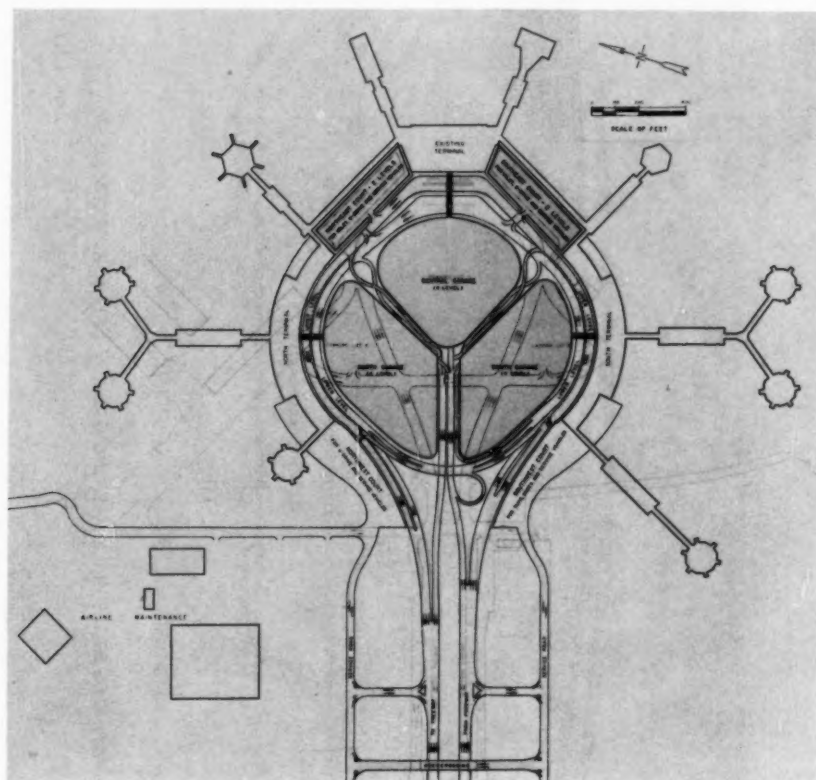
ULTIMATE PLAN FOR TERMINAL AREA
